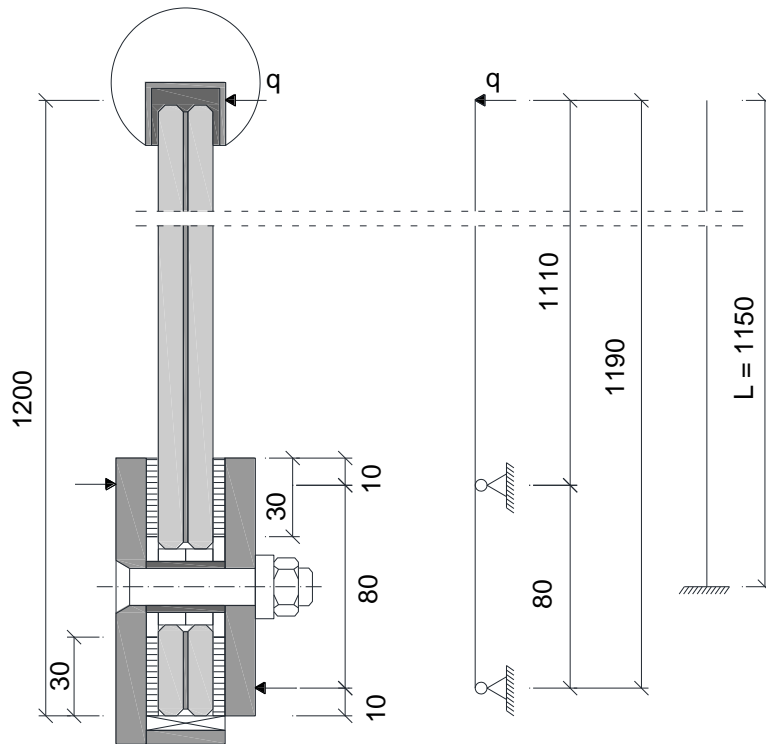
Railing slab anchoring detail, vertical dimensions
